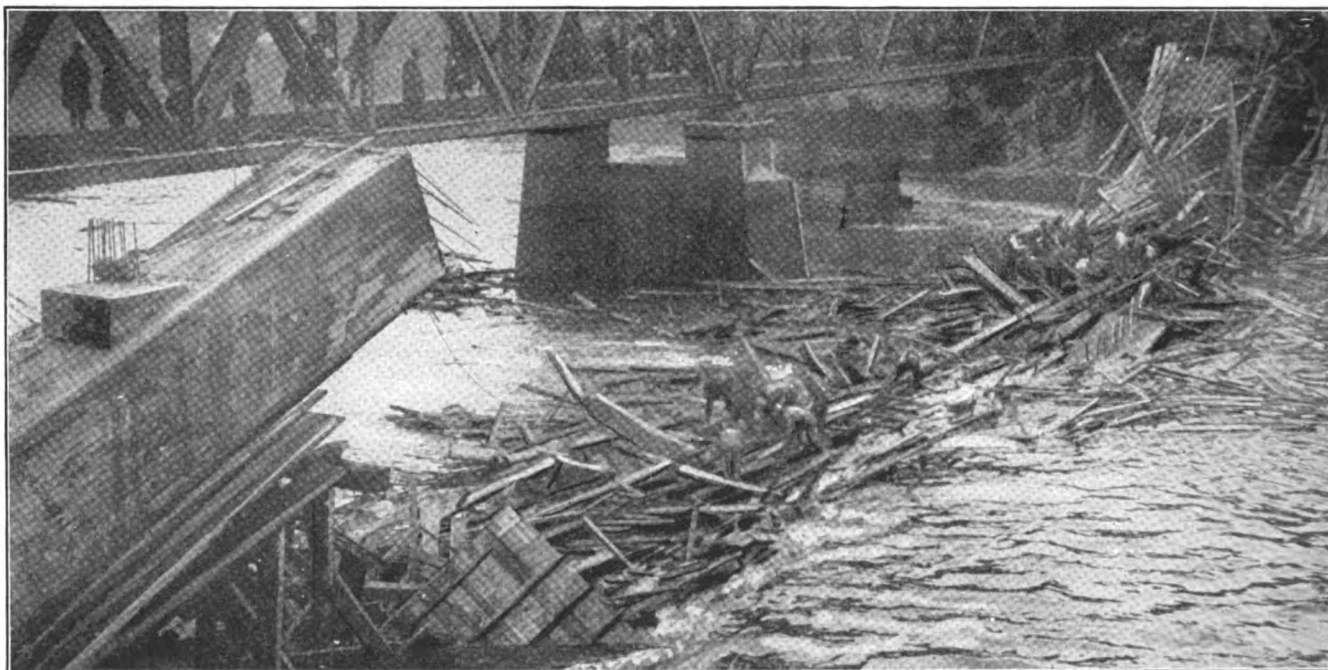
VIEW OF POST ST. BRIDGE LOOKING WEST AFTER COLLAPSE
